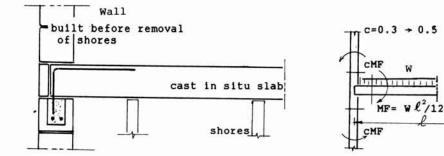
Typical loadbearing wall building and panel's internal forces.
